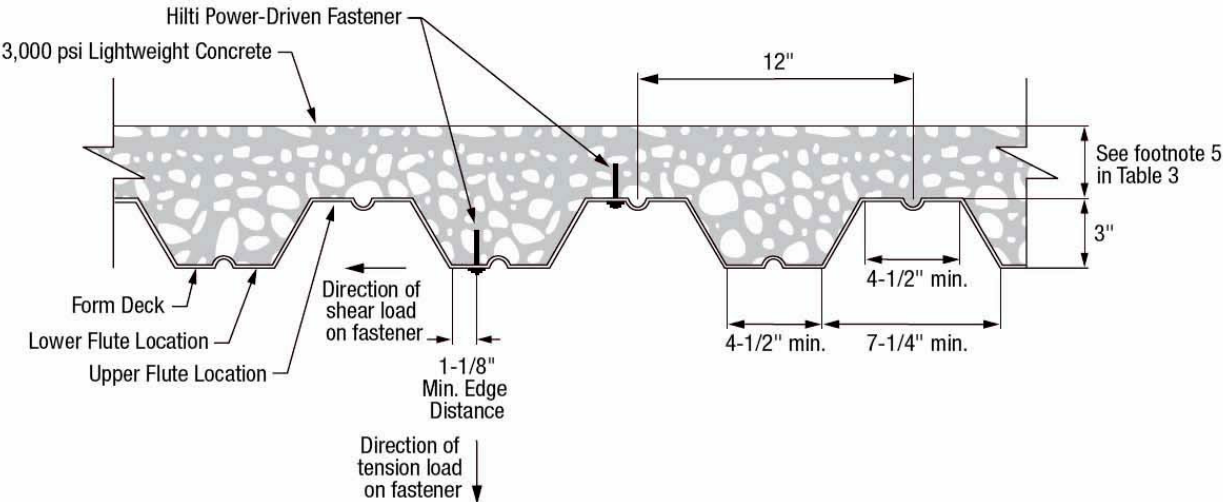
HILTI FASTENER INSTALLATION LOCATION IN 3-INCH-DEEP COMPOSITE FLOOR DECK
